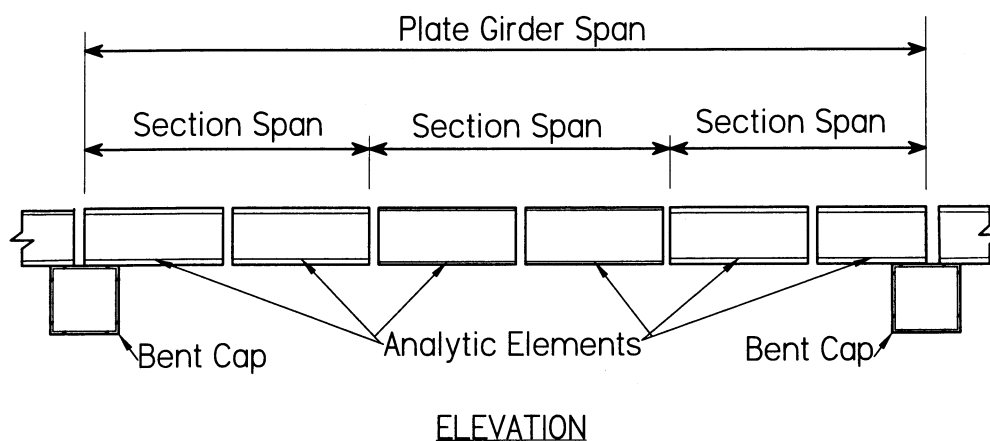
4: Plate Girder Analytic Elements, Section Spans, and Plate Girder Span
